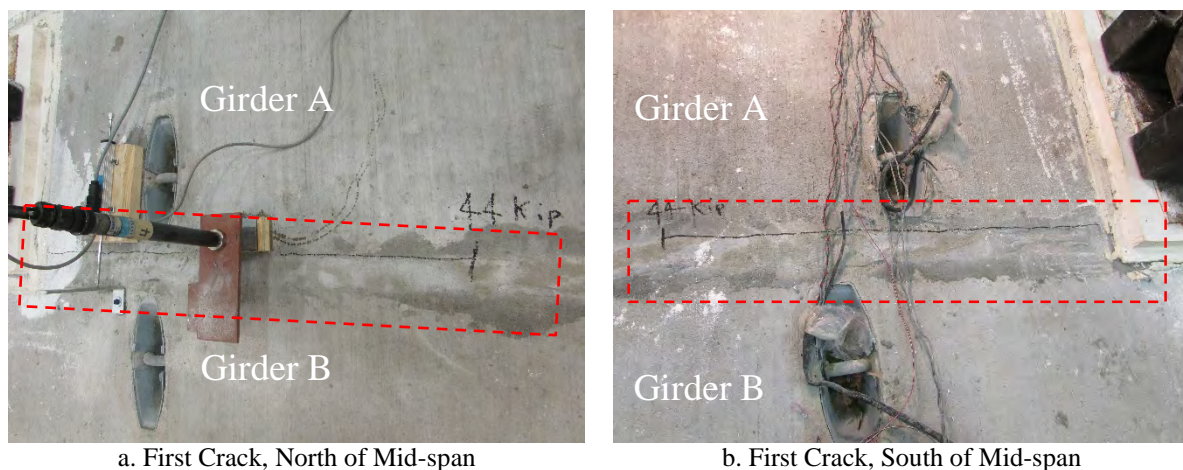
Girder-to-Girder Joint Cracking of Conventional Double-Tee Bridge Specimen
